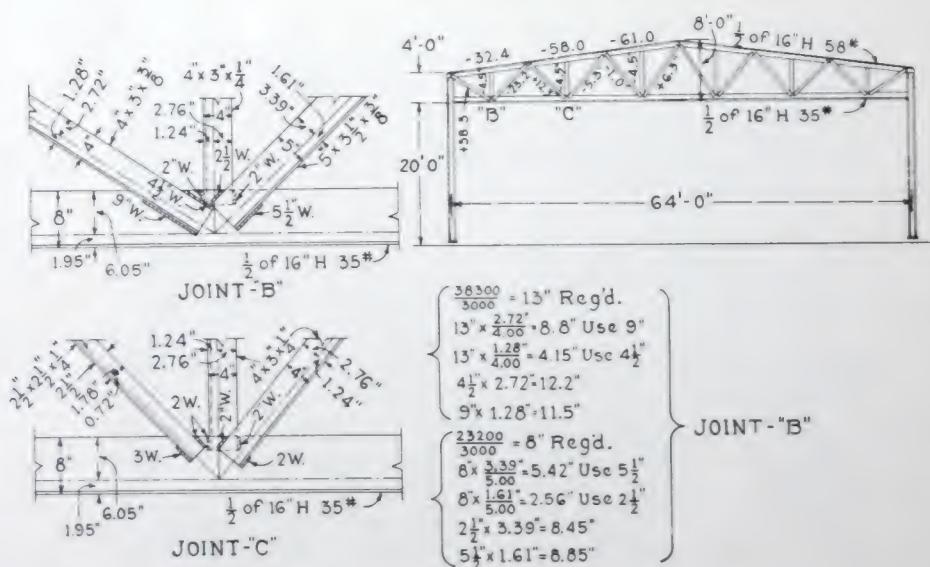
Details of Another Type of Arc-welded Truss
